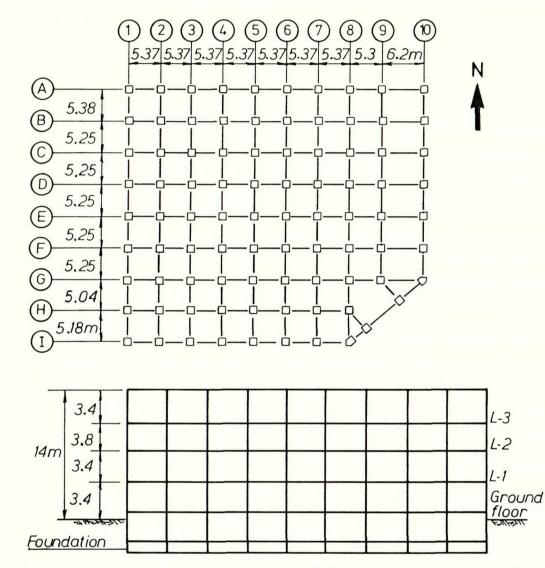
Plan and Elevation of a Building Repaired and Strengthened by Jacketing of Columns
